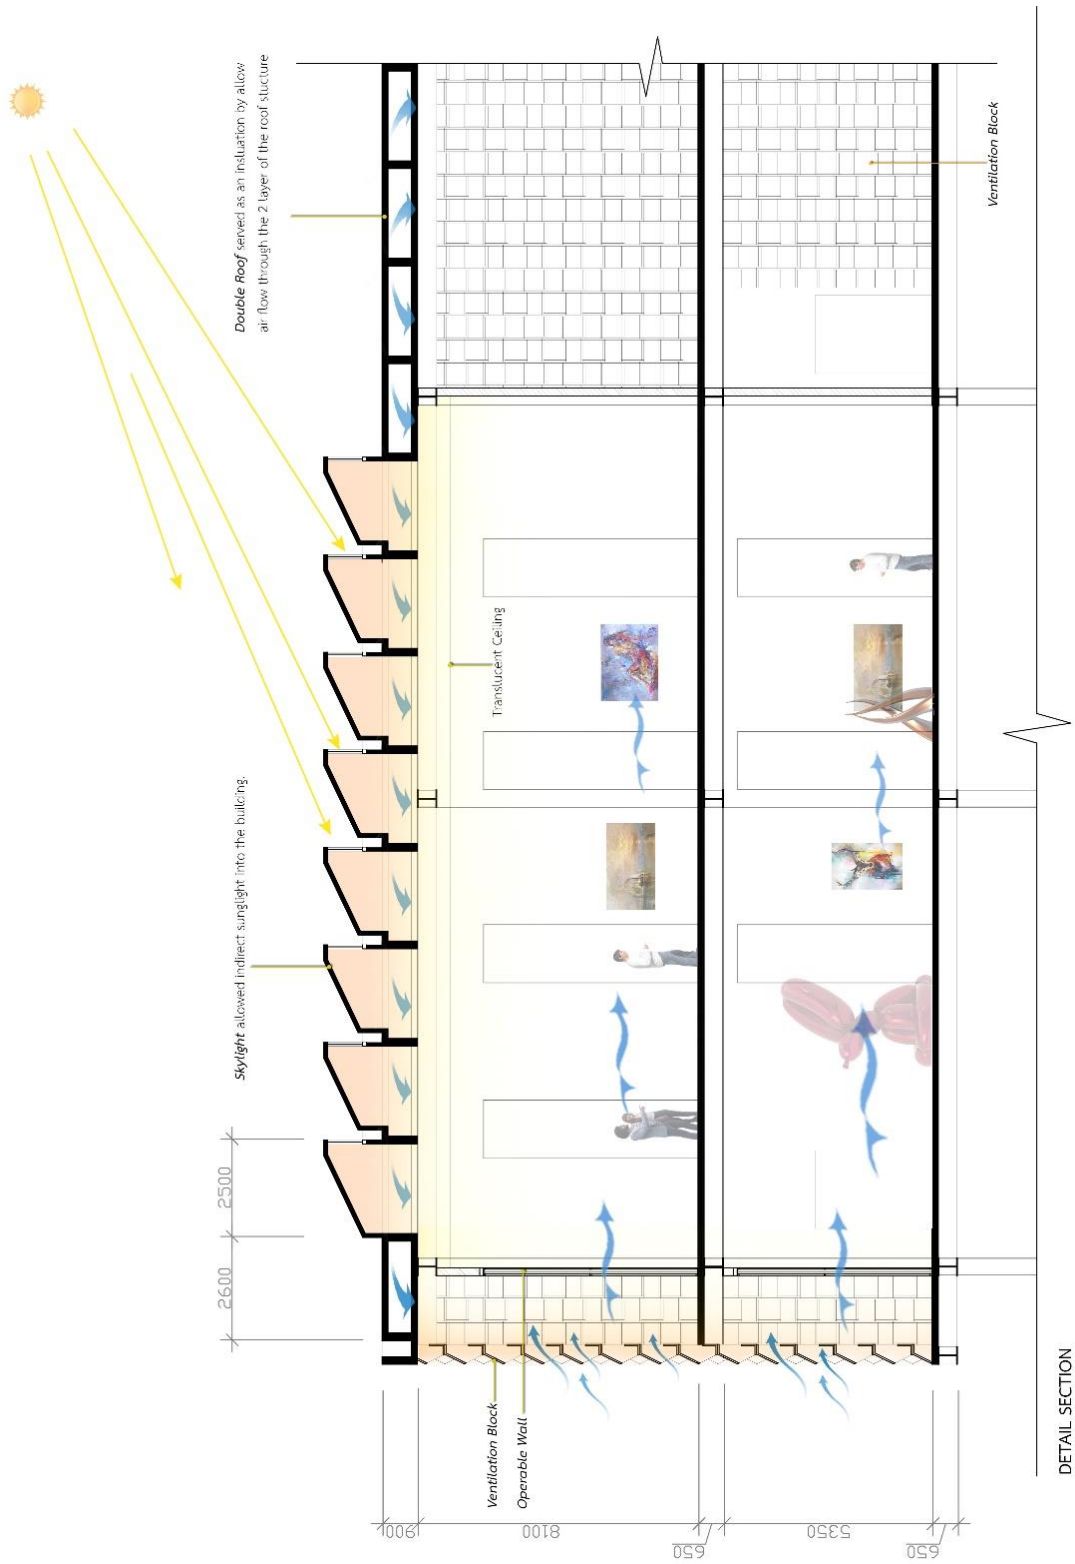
20 Double roof and double wall design allowing ventilation and indirect light into building
